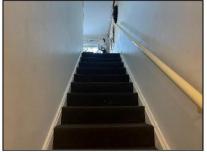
Internal view from the Ground Floor, facing up the later-addition staircase.
